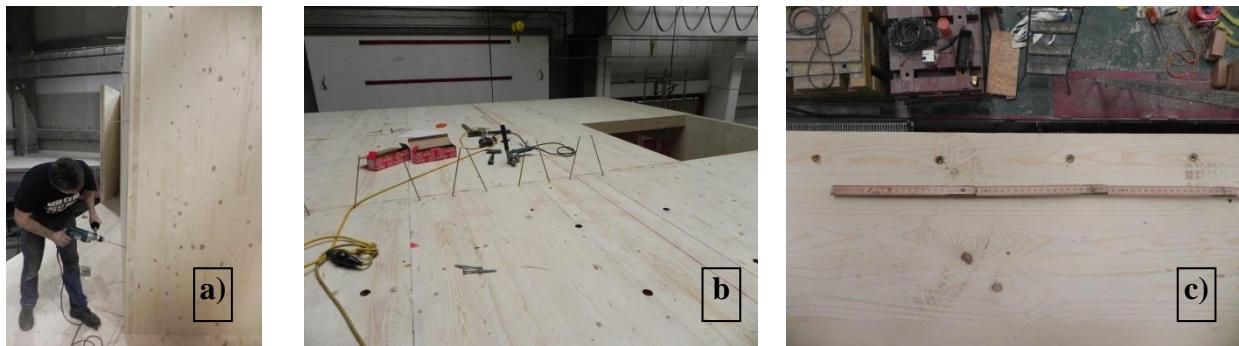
Screw connections out of plane: a) drilling; b) wall-floor joint; c) controlling of the screw distances
